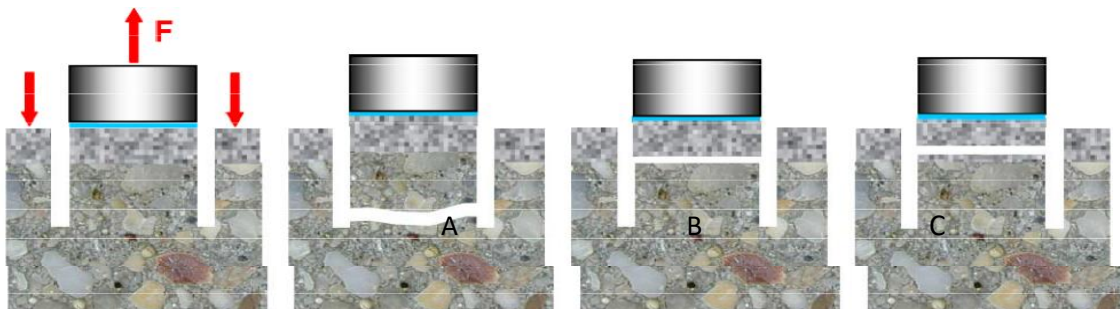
A) Failure in substrate, B) Bond failure, C) Failure in overlay[14].
